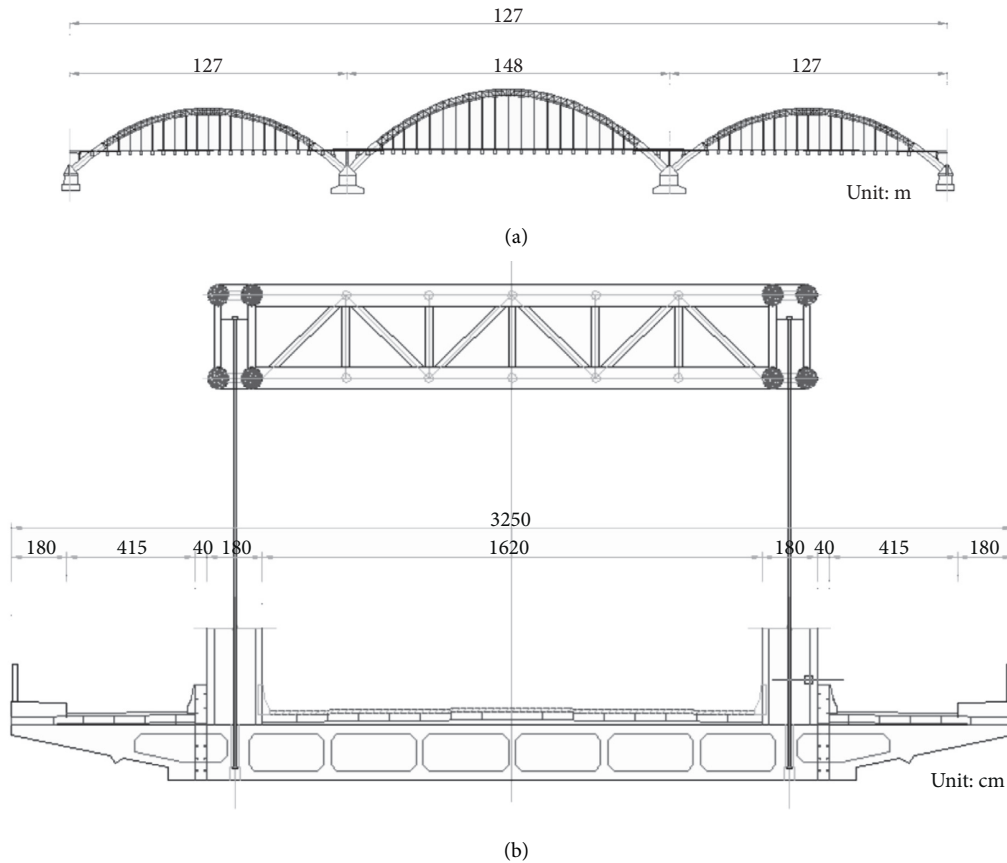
Bridge structure diagram. (a) Bridge elevation. (b) Bridge section view.
